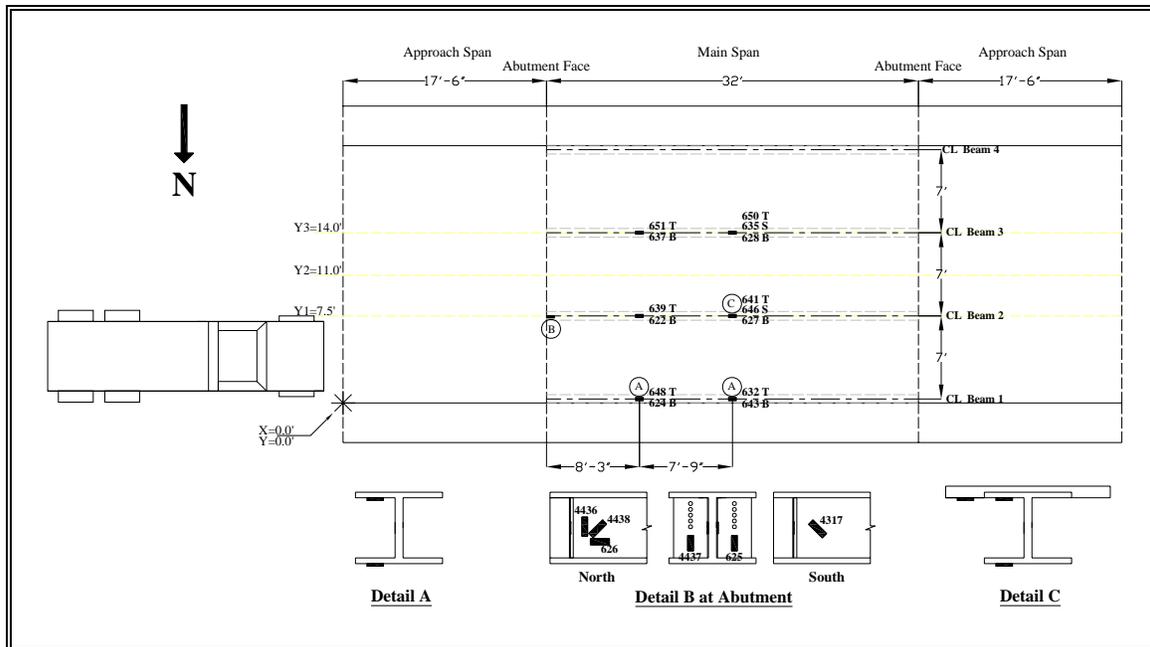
Load Path and Strain Gages Configuration Plan
